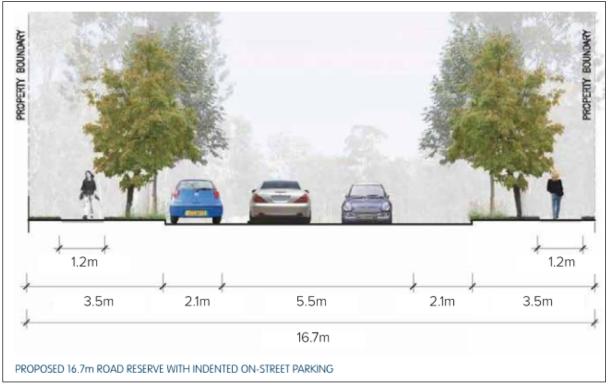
Local Road Cross Section (Source: Leagues Precinct, 231 Gurwood Street - Urban Design Report, prepared by RobertsDay)
